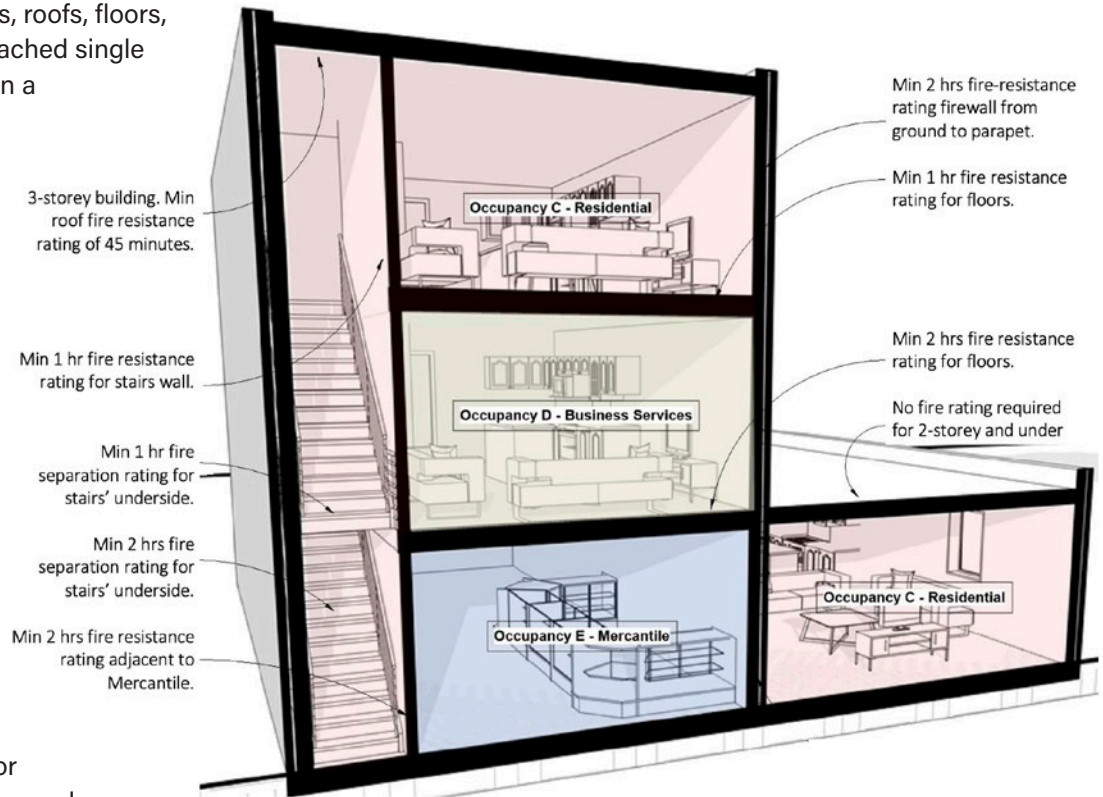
Fire separation and protection requirements for a 3-storey mixed-use building (drafting credit: BM Architectural Design)
